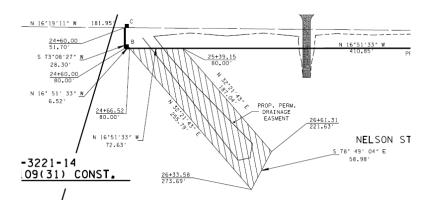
A-10B Example of Drainage Easement as Shown on Right of Way Details Sheet
